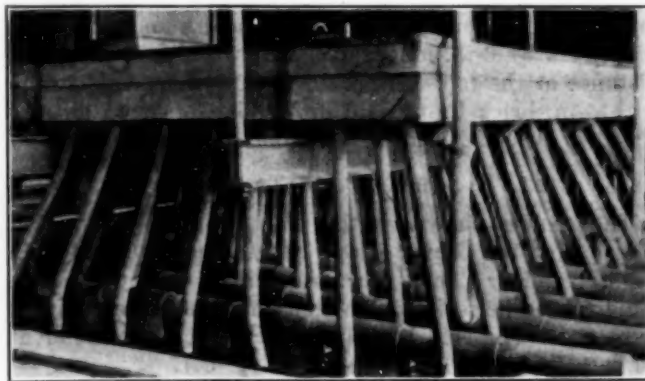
DISTRIBUTION PAN ON TOWER FLOOR
